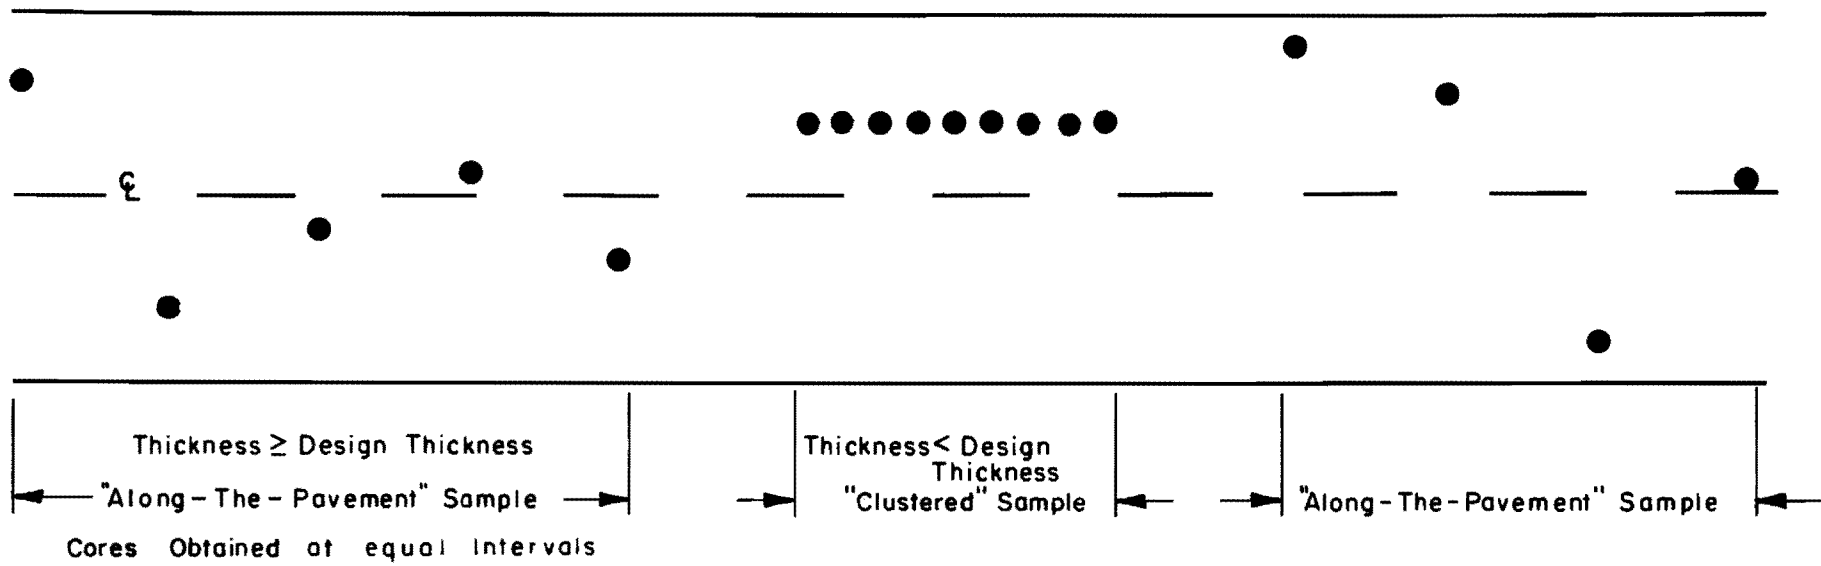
Typical core sampling plan used by the Texas Highway Department for blackbase and asphalt concrete.
